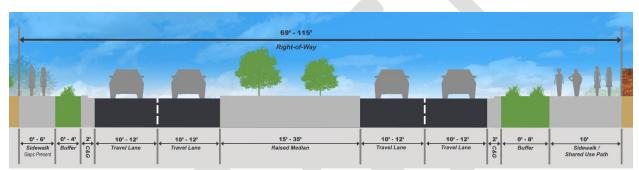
Typical Section for Paseo del Norte to Paradise Blvd
